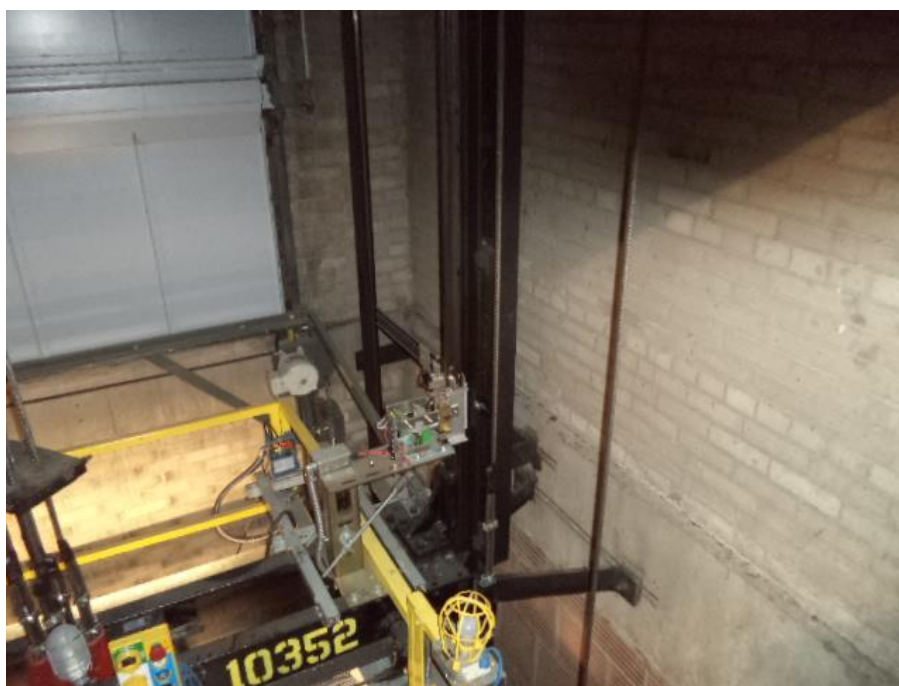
Overview of first floor elevator shaft inside loading freight elevator
